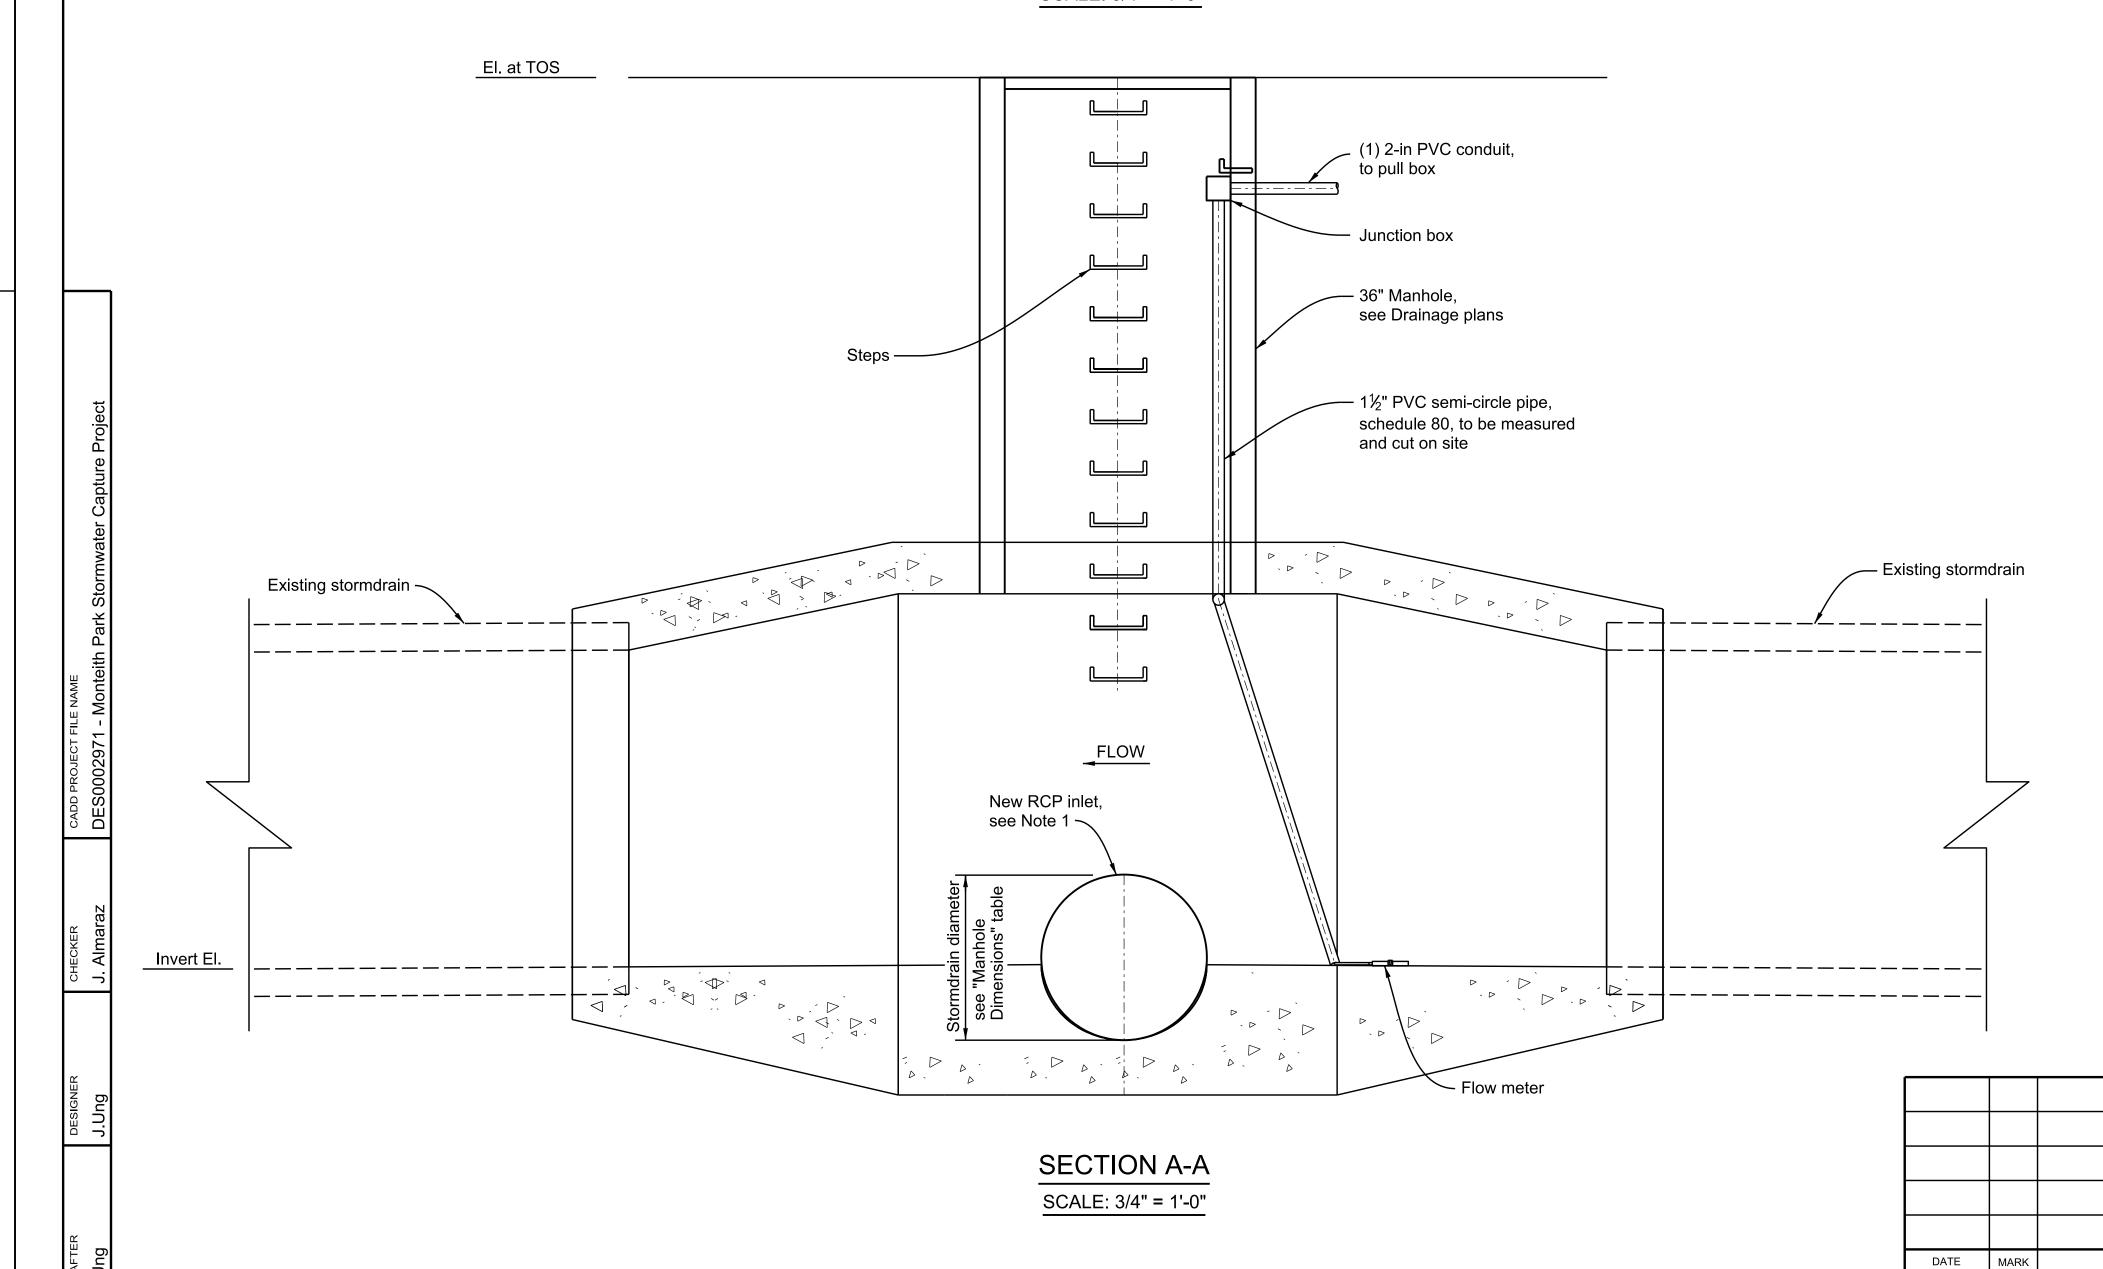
", (M-1) TYPICAL DIVERSION MANHOLE PRESSURE TRANSDUCER
